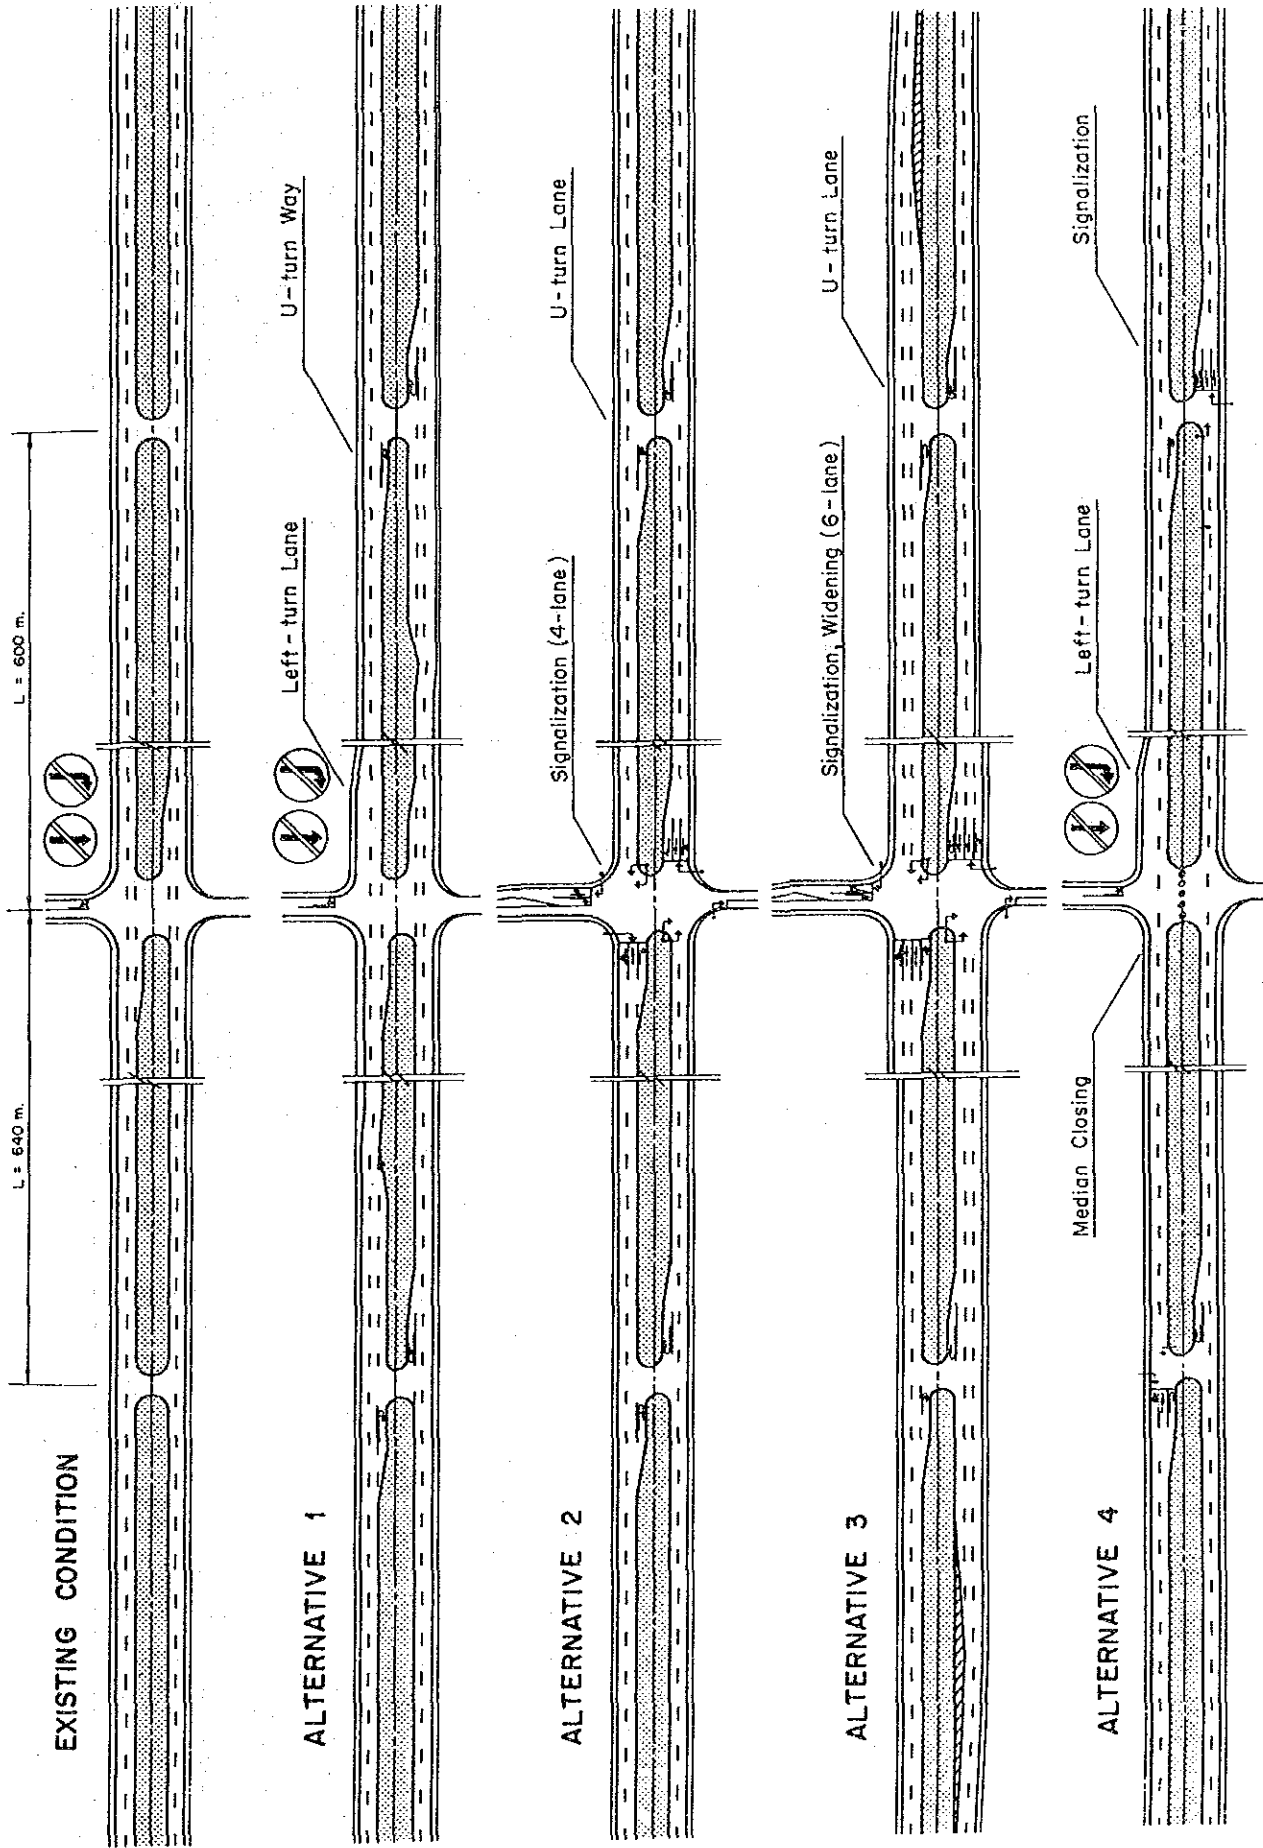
ALTERNATIVES OF IMPROVEMENT PLAN FOR S-15
